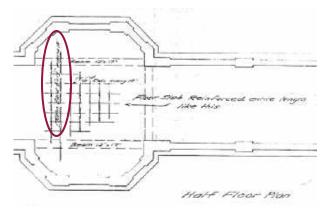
Floor plan with deck slab reinforcement as shown in the original design plans. Note that the transverse and longitudinal rebar spacing is shown at 18".
